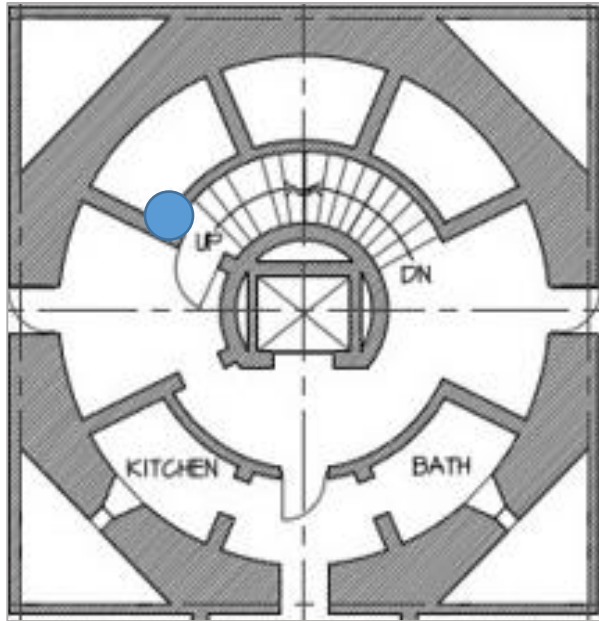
Blue dot shows florescence observed at the bottom of the stairs on the *Powell Street* mural.
